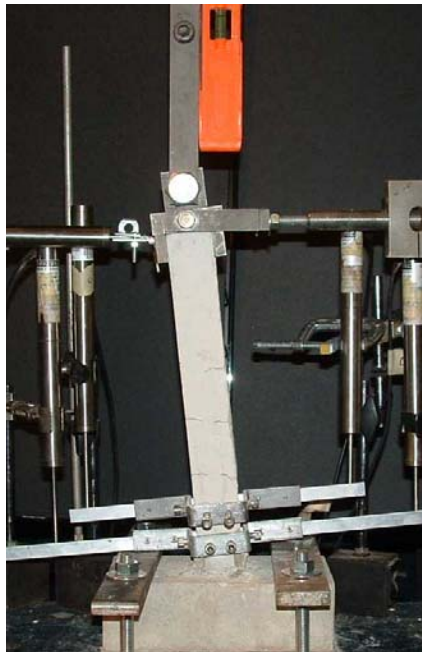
Overall Column Displacement and Cracking at Displ. Level 4 for Model Column Test M-5, 5-mm DHFRP Reinforced R/C Column.
